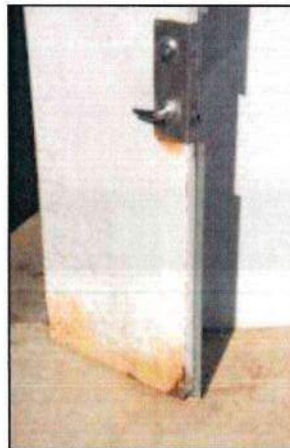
Fire Station #1 The exterior door to the hose tower is significantly rusted.
